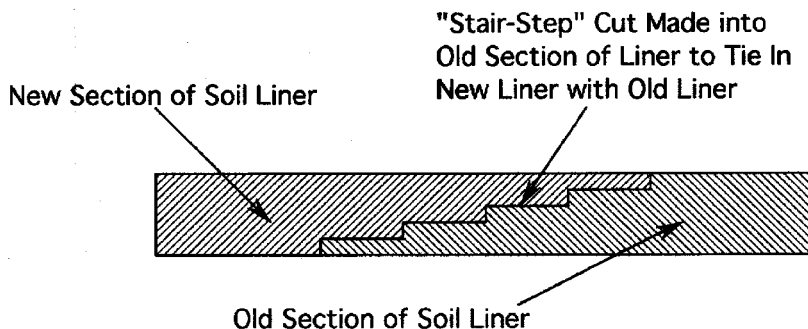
Tie-In of New Soil Liner to Existing Soil Liner.
